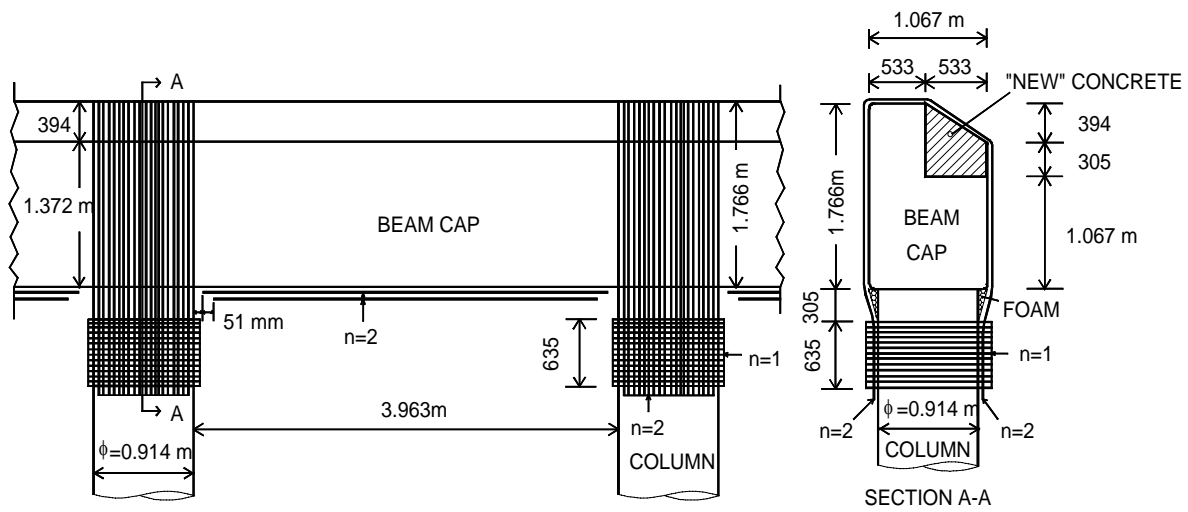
CFRP composite design for column to bent cap “U-strap”
